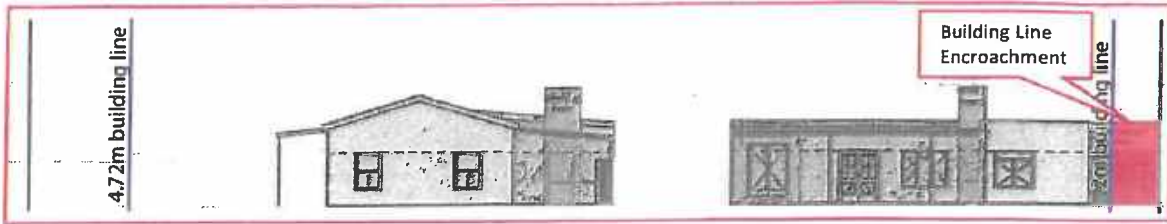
Northwest Elevation Illustrating Rear Building Line Encroachment of Second Dwelling
